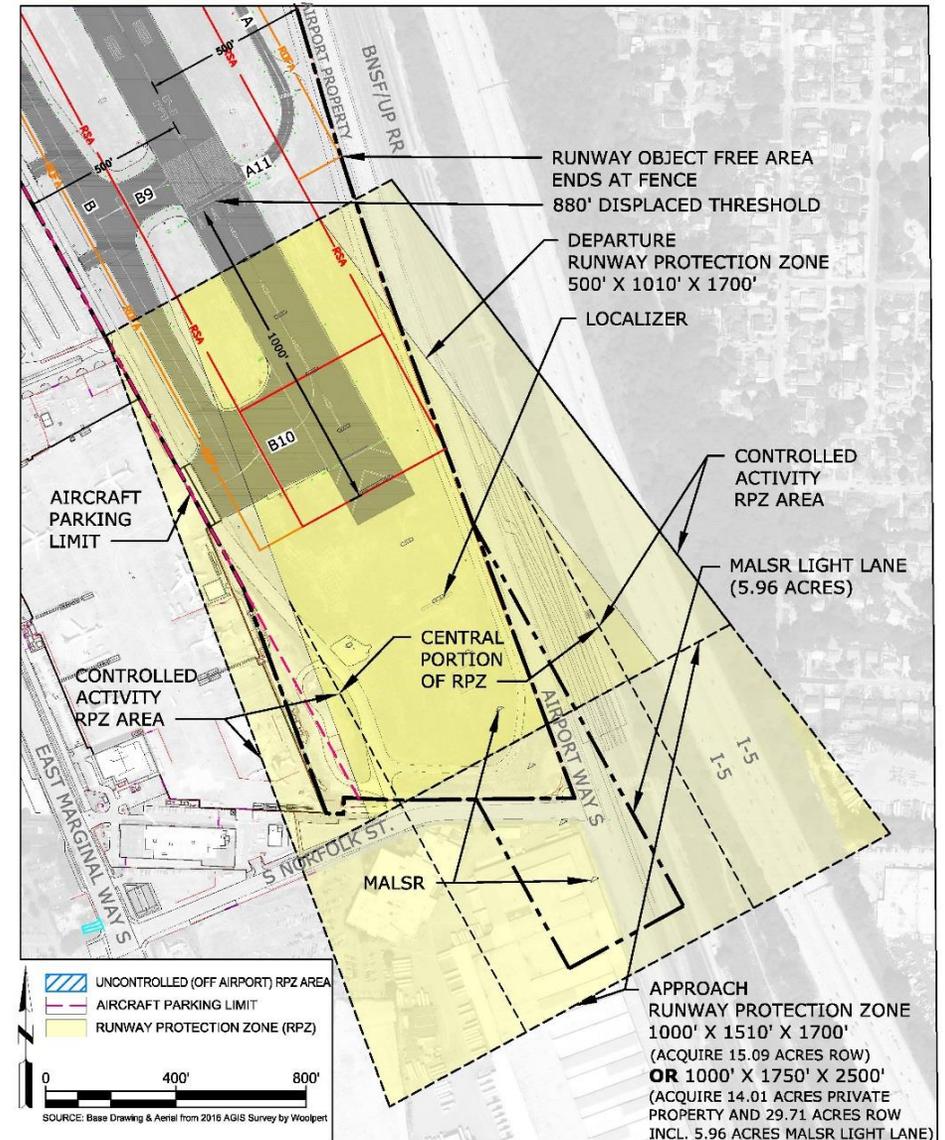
RUNWAY 32L INSTRUMENT APPROACH PROCEDURE/ RUNWAY PROTECTION ZONE DETAIL (Alternative Two)
